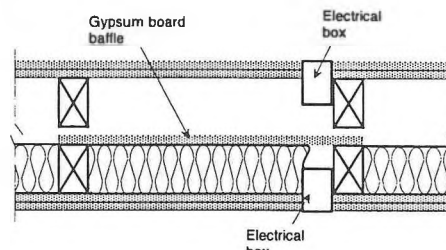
Sketch of a baffle for a double stud wall. Note that the structural isolation between the two faces is preserved.
